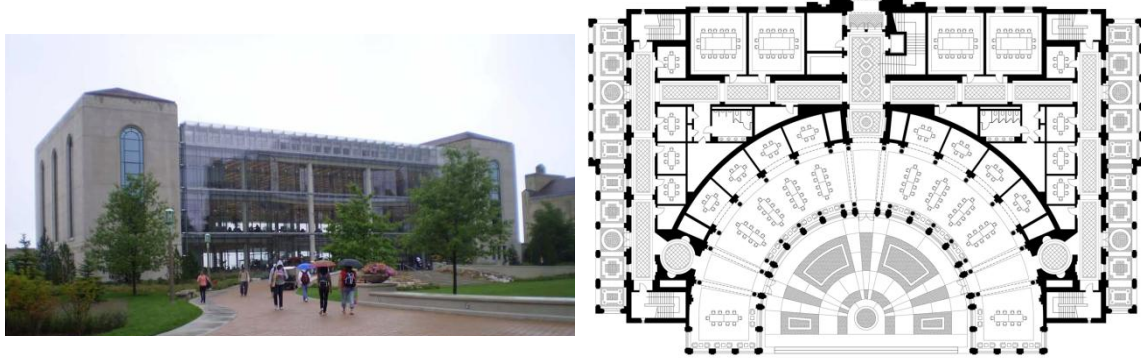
(Left) Subject Case: Loyola University of Chicago's new Klarchek Information Commons (LEED Silver); Figure 1b. (Right) Design Case: Proposed Ground Floor Plan. Image credits: John C. Mellor.
